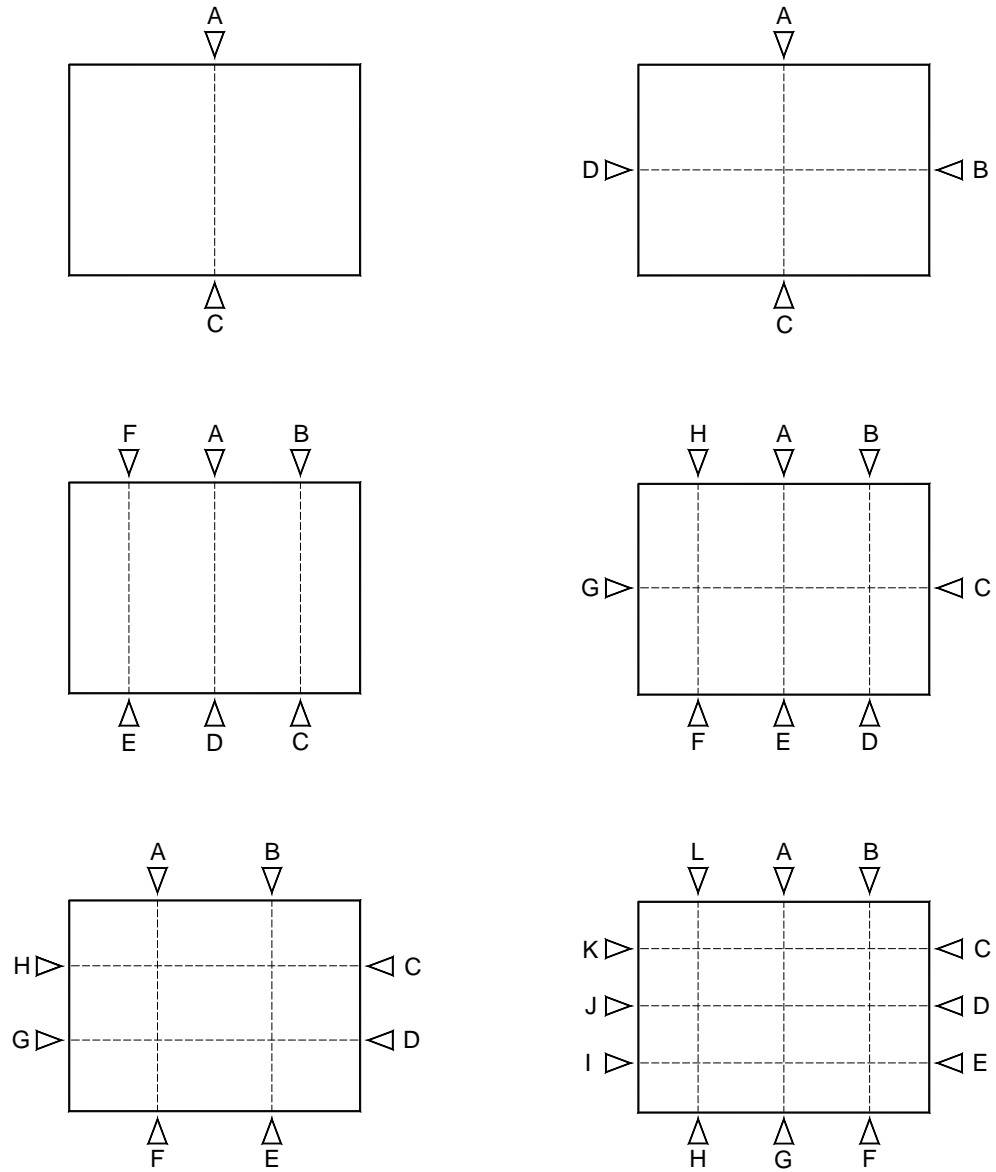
1 Typical Convergence Point Array Configurations Showing Anchor Designations
